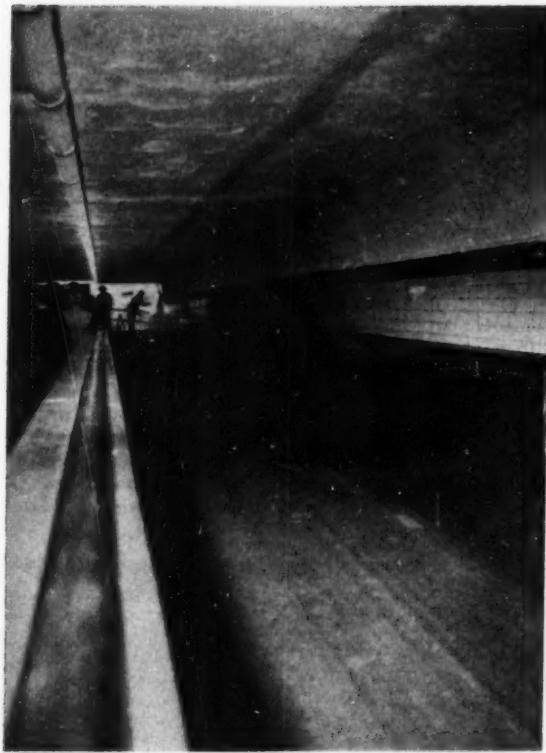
Completed Speedwalk with moving handrails installed on both balustrades. A walkway, left, is alongside.
